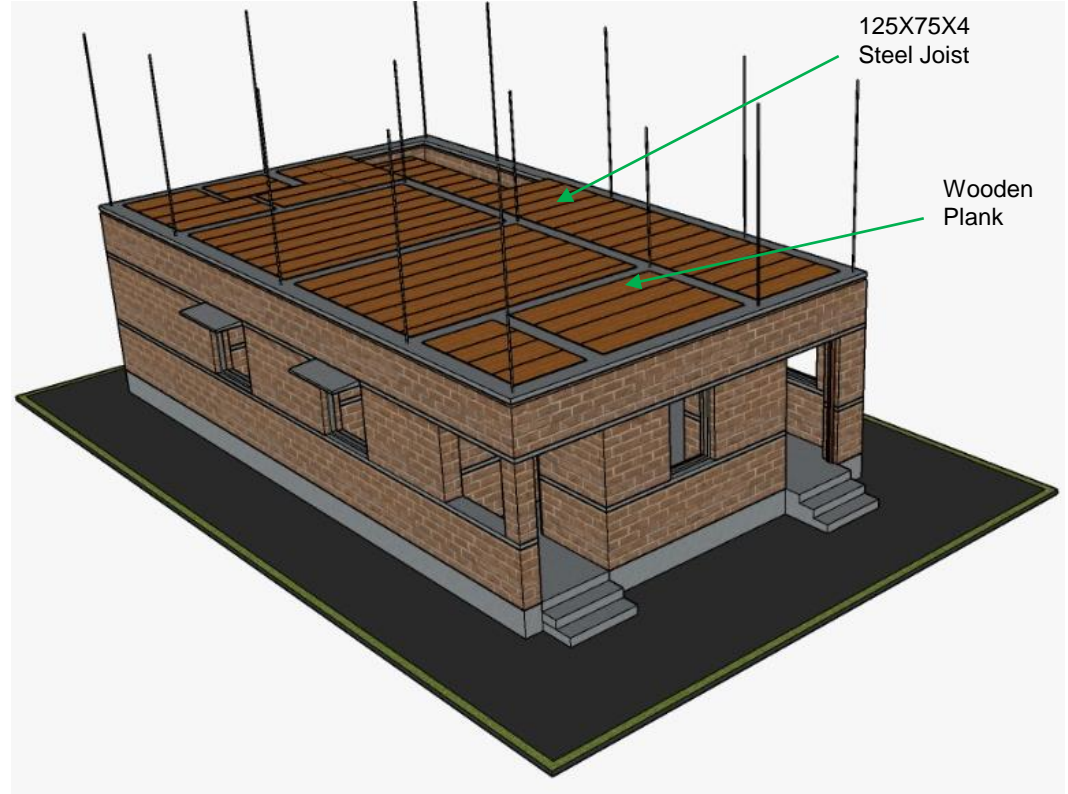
26.Positioning of steel rolled sections/ Wooden Rafters
